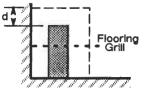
Example of Machinery Mounted on the Floor or Near to a Wall
